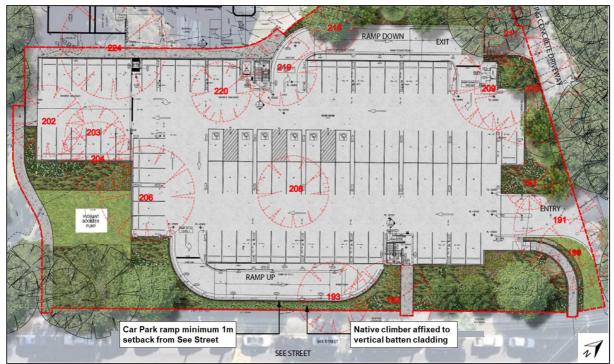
| Car Park landscaping plan and See Street setbacks (Source: Applicant's Amended Car Park plans submitted on 14 August 2020).
